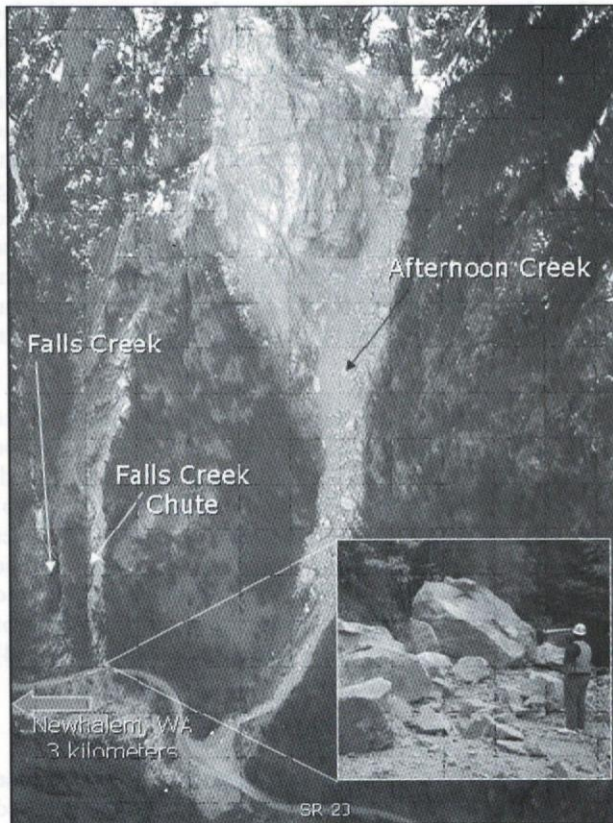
Afternoon Creek rockslide above SR 20 near Newhalem, WA. Photograph provided by John Scurlock, Concrete, WA.
